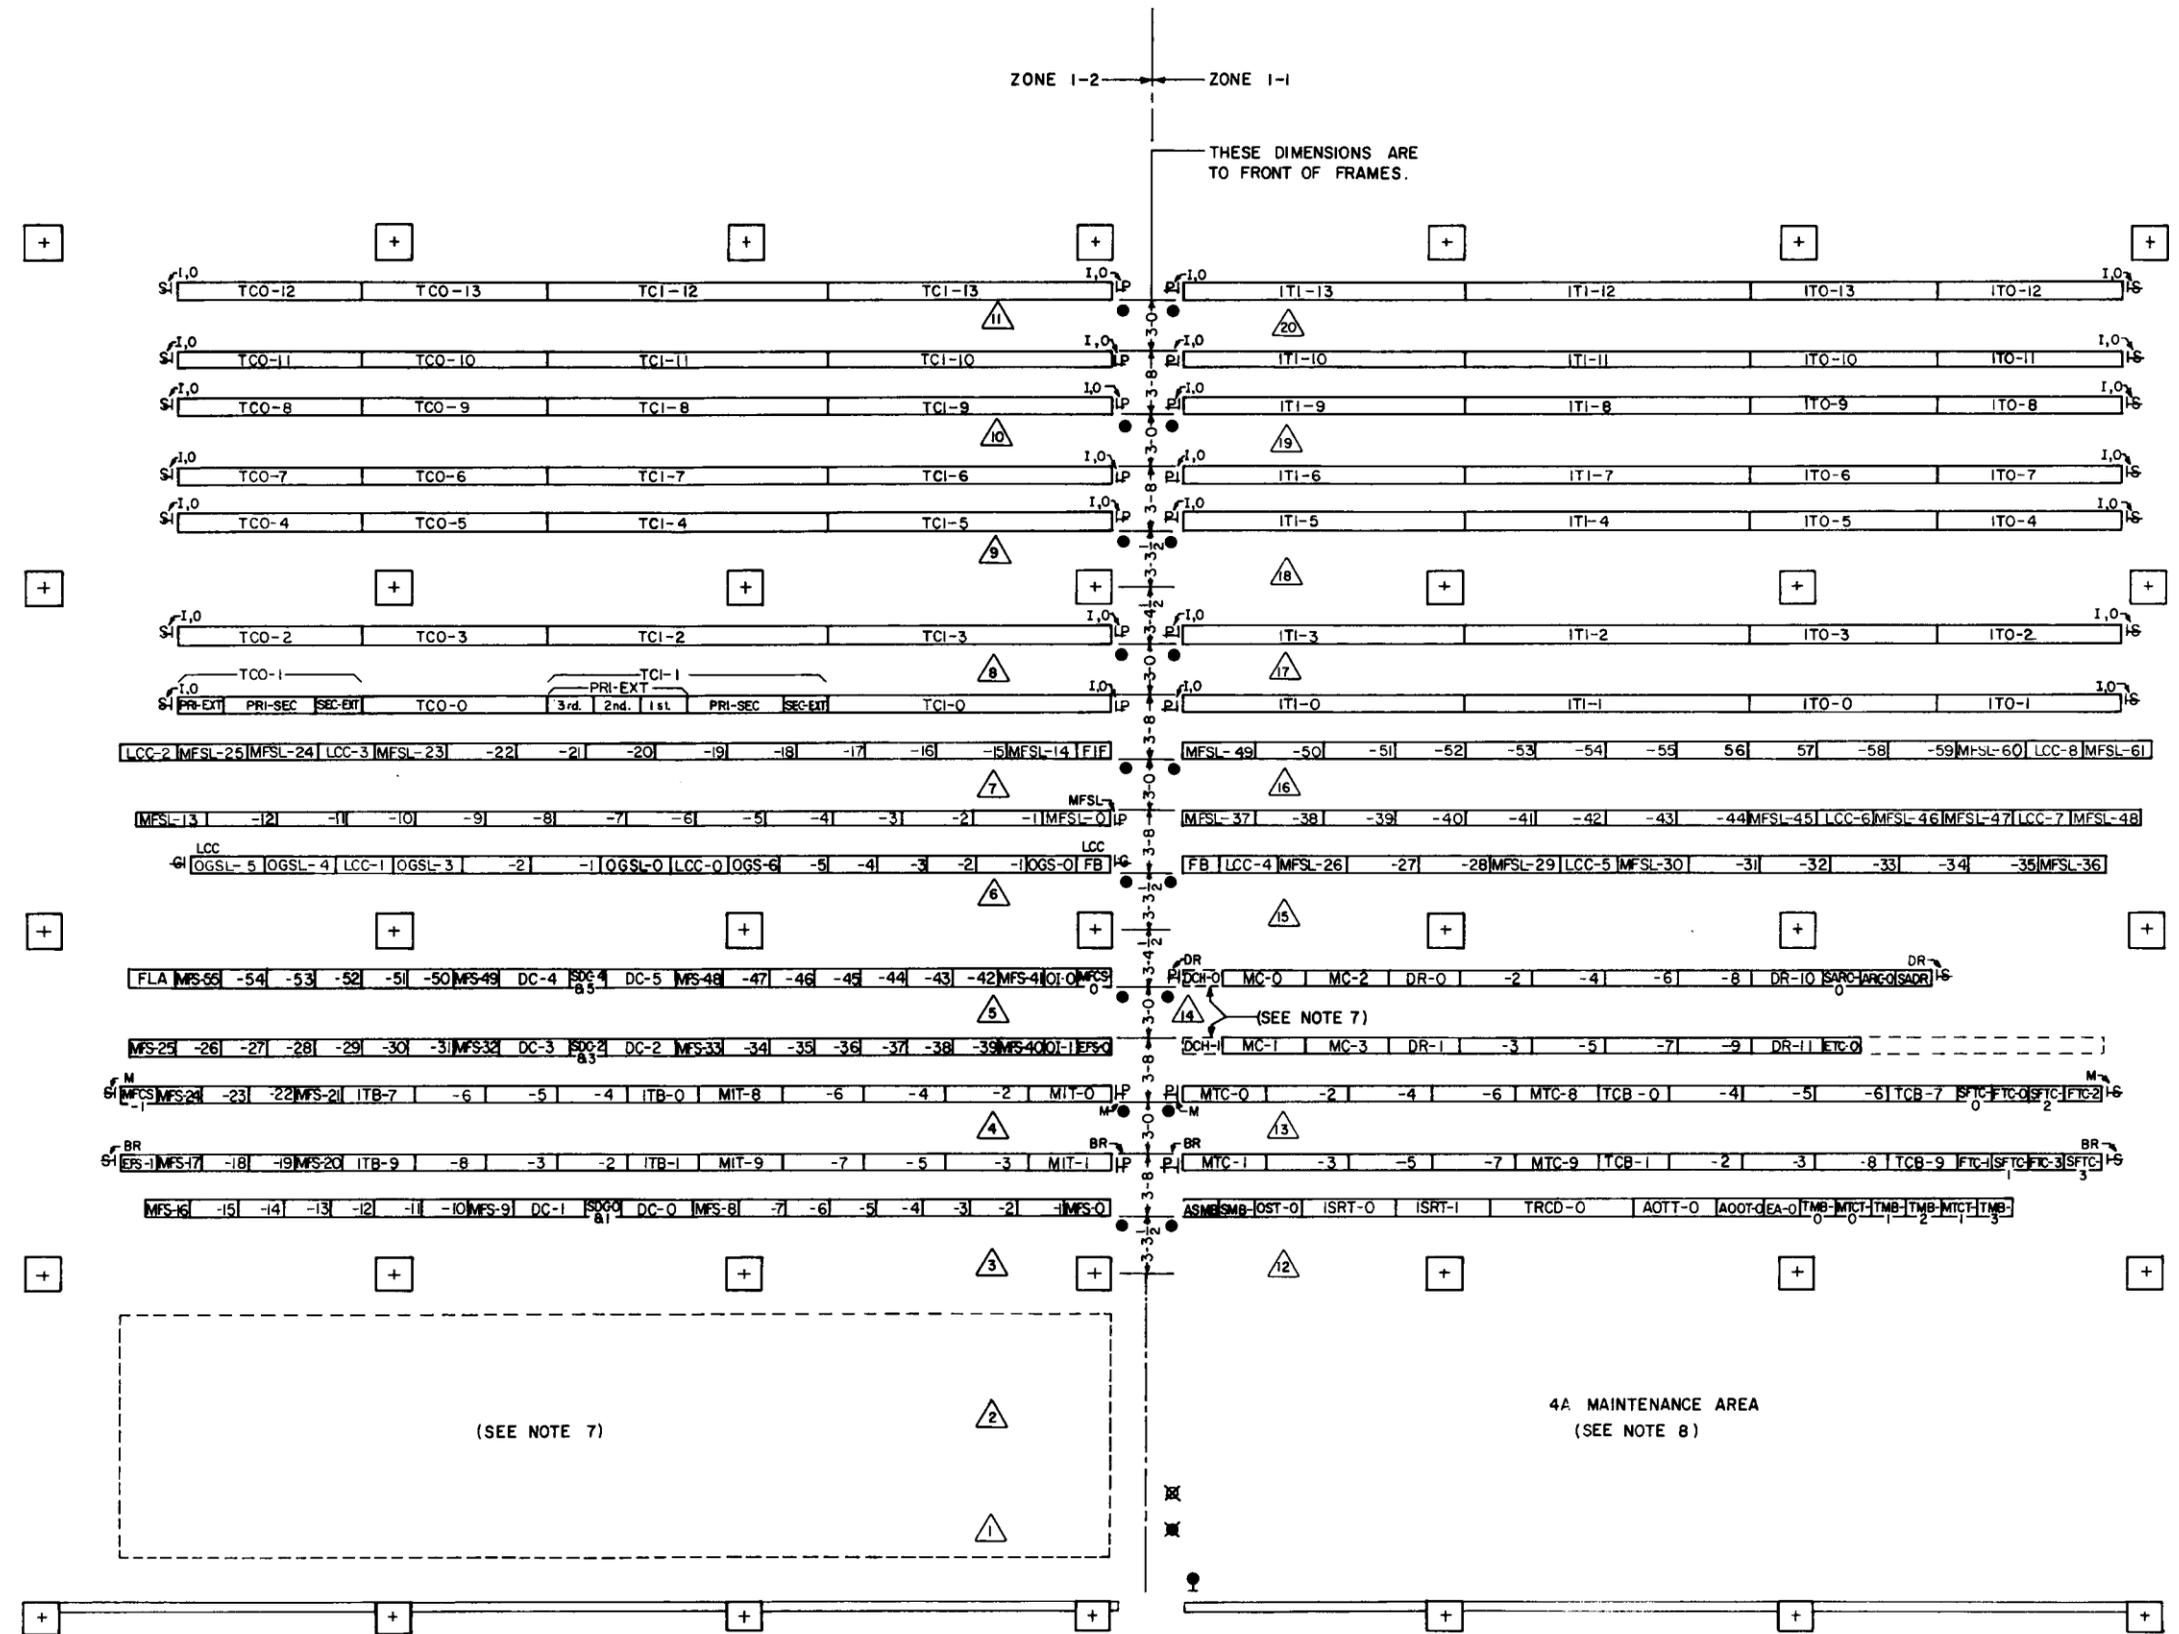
Typical Floor Plan - Switch Operation Office (Non-CAMA)
